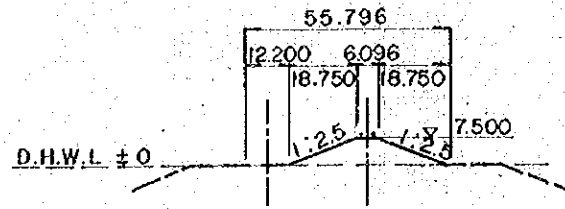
JAMUNA RIVER BRIDGE APPROACH (SINGLE TRACK RAILWAY & T
